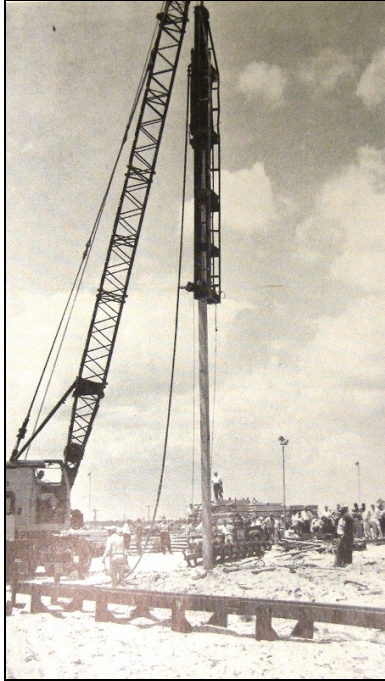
Engineers and contractors gather to watch the driving of a prestressed-concrete pile. The lightweight and strong piles were more easily handled than reinforced-concrete piles. Source: Georgia Highway Proceedings (1957).
